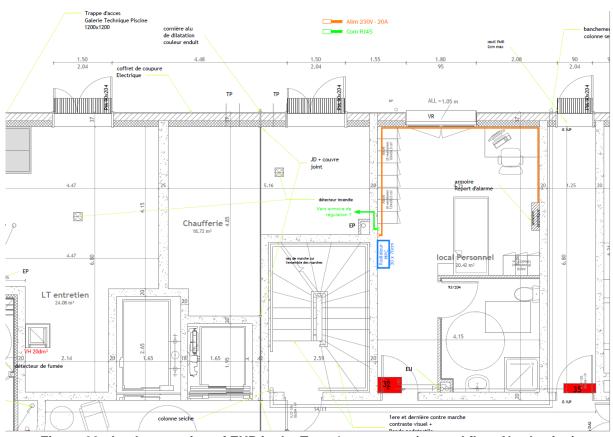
Implementation of EHP in the Type 1 apartment (ground floor North wing)
